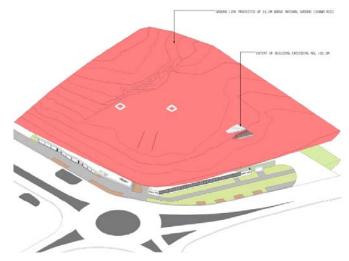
diagram showing building element project beyond the 11.5m above ground line.
